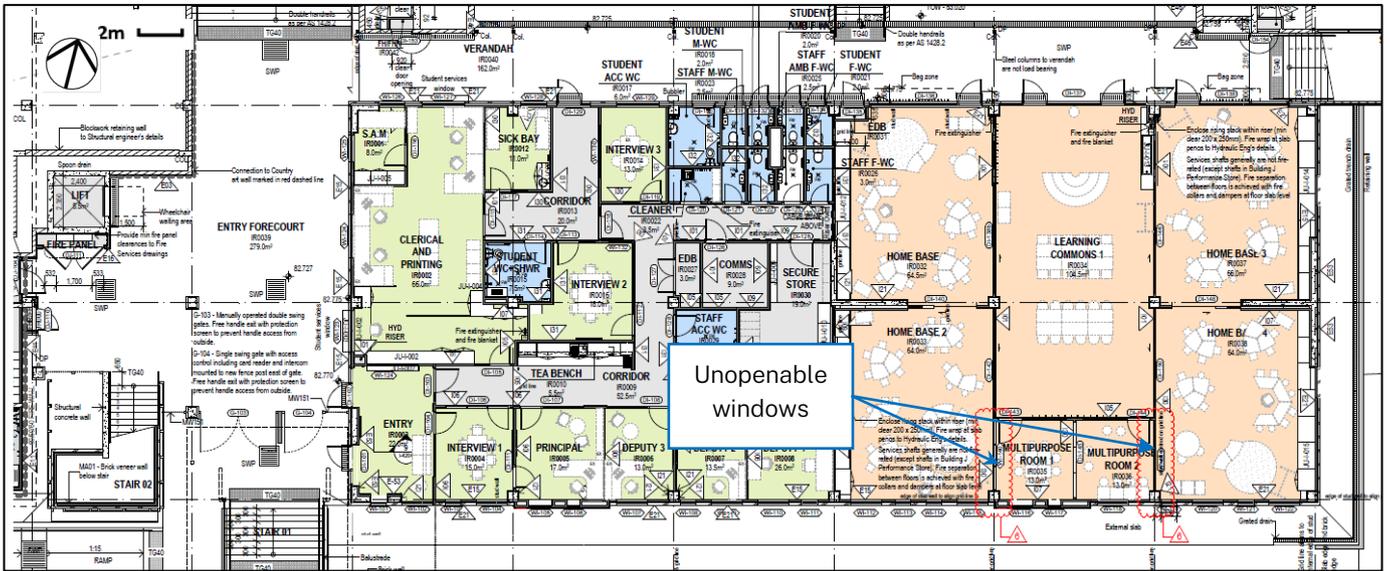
| Proposed level 1 floor plan of Building I (Source: Modification 3, 2023)
